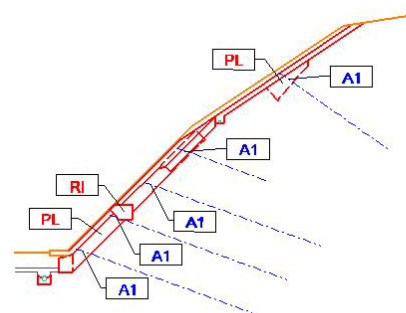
Schoren retaining wall, cross section from dashed vertical line in Figure 4-17
